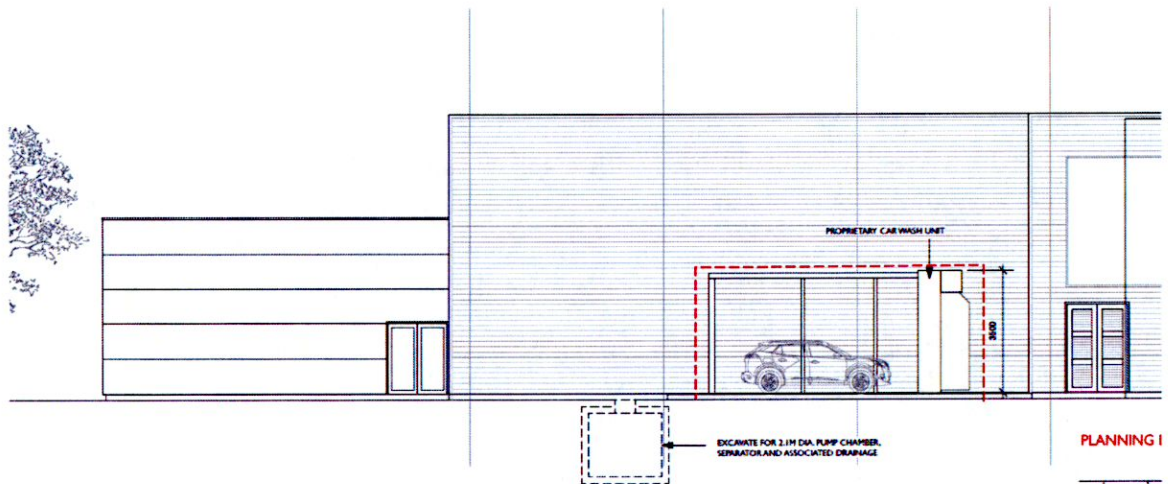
Proposed east elevation, extent of car wash outlined in red.
